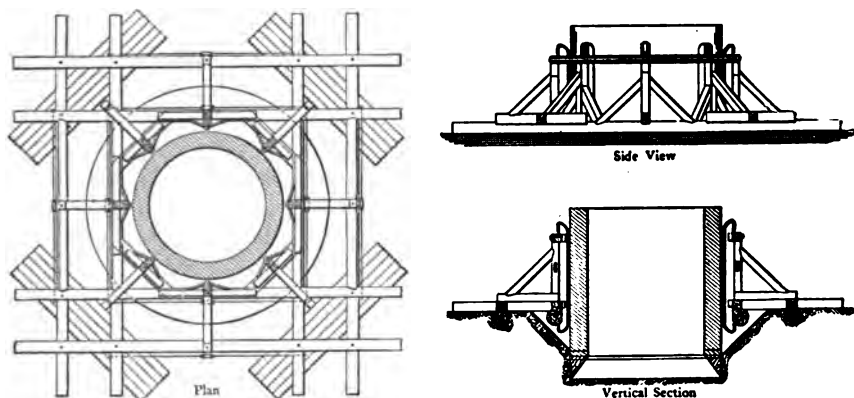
ARRANGEMENT OF GUIDES FOR DROP-SHAFT SINKING.
